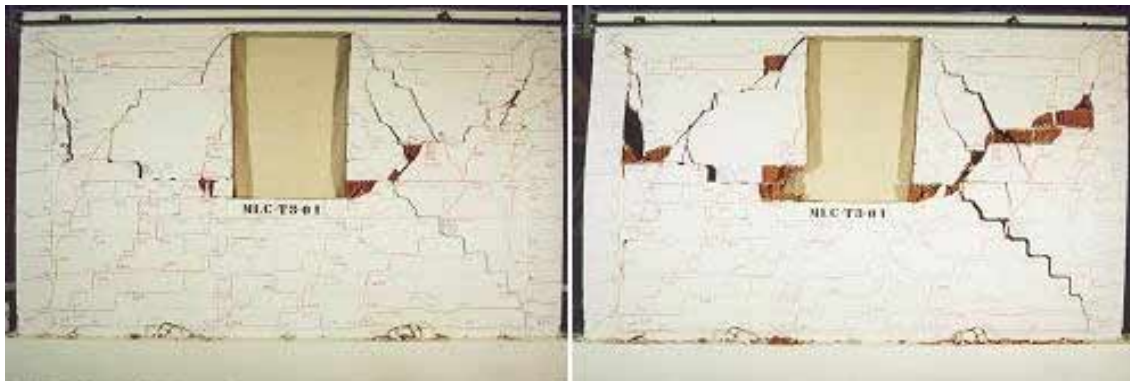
Damage of hollow clay brick masonry wall (pattern 3) before the fracture of horizontal reinforcement under the opening (left) and after its (right)
